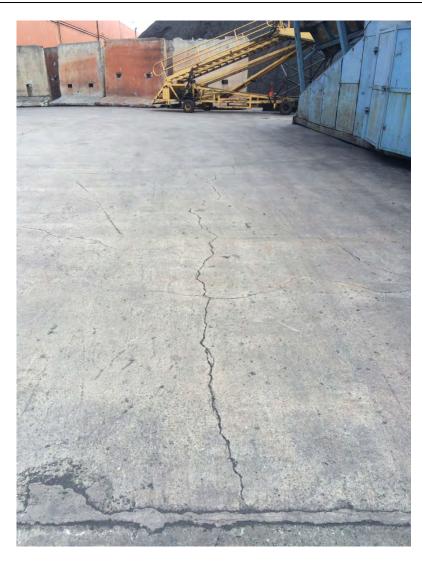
Looking south along western alley of secondary storage area: surficial cracking in SW-3 area, with sealed crack in foreground.
